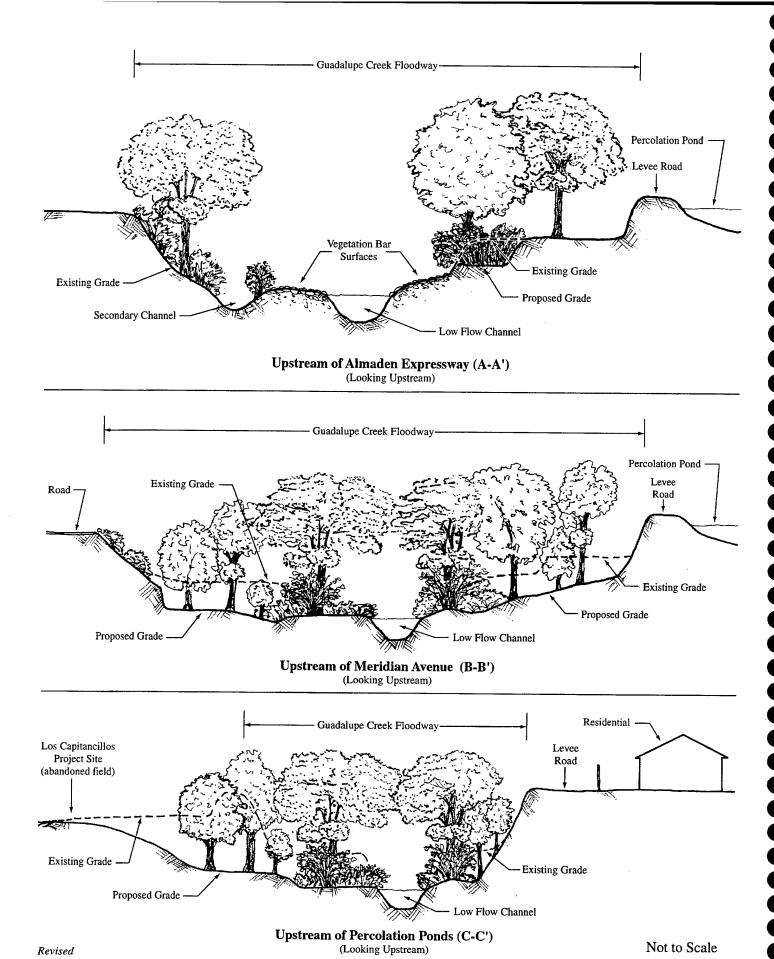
Conceptual Guadalupe Creek Cross Sections (Cross sections are indicated on Figure 3.4-4)
